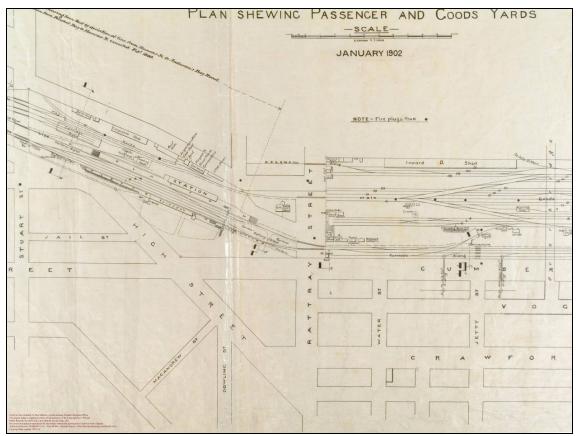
Historical plan showing structures near proposed SH88 deviation in 1902 (DABB-D101-2a - Plan DE304 - Image 1).
